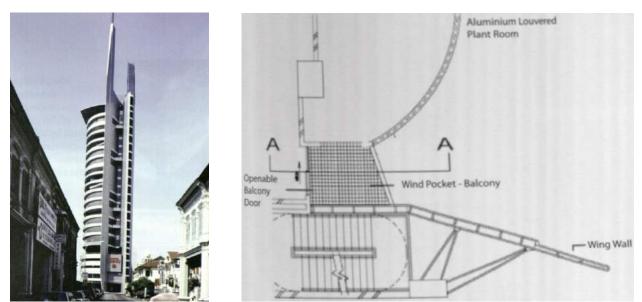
Wing Wall of the Menara UMNO, Malaysia Fig. 237. Wing Wall Detail of the Menara Umno, Malaysia
